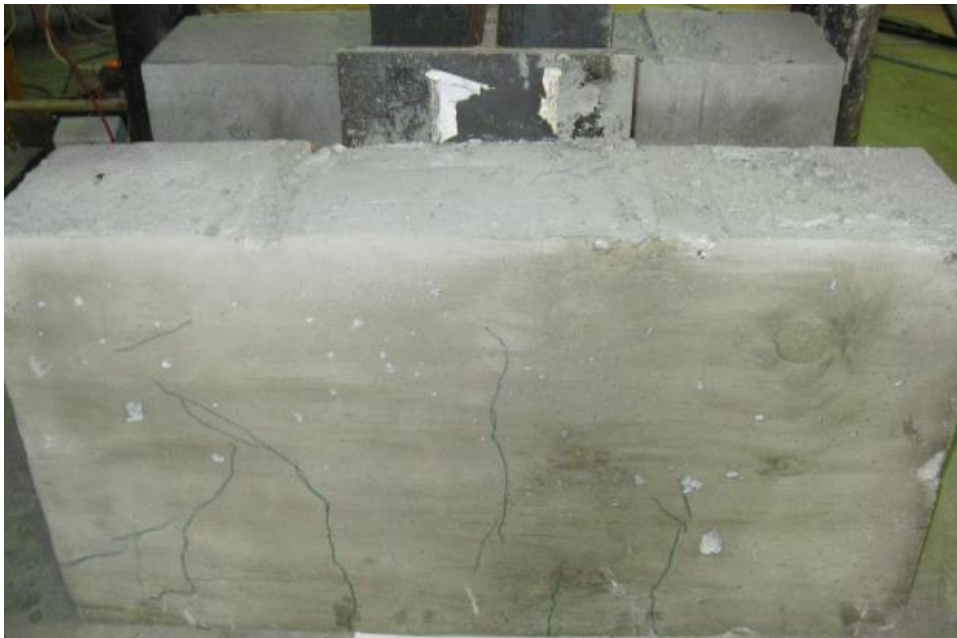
A photograph of concrete failure (Dang 2013)
